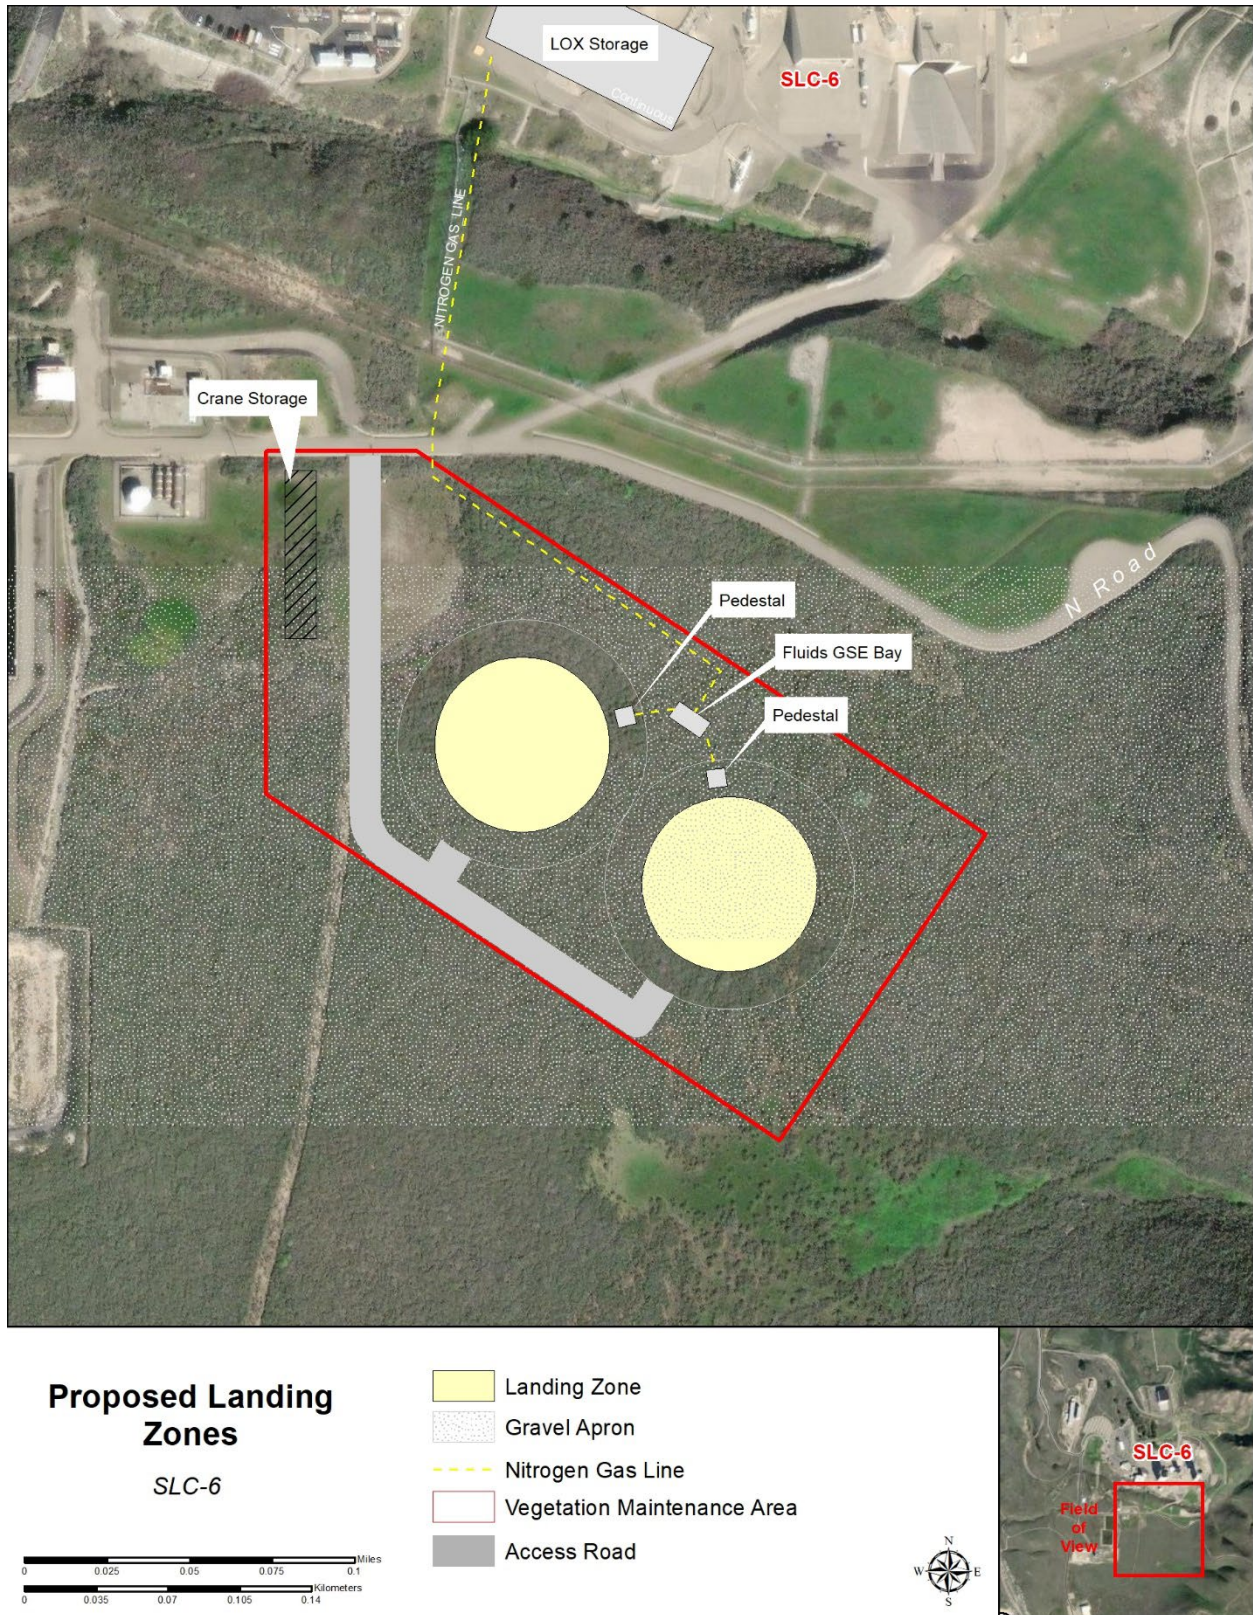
Conceptual site layout for construction of new landing zones.
